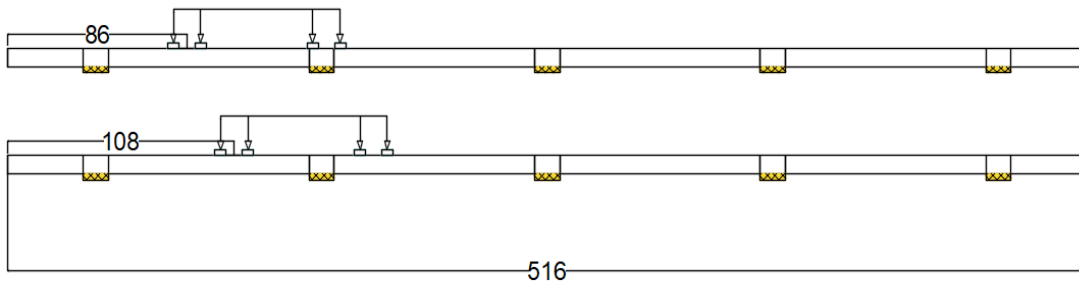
Location of P-15 truck for 9 ft girder spacing deck slab (Case 1, load located at the centerline of two patch load, unit: in)
